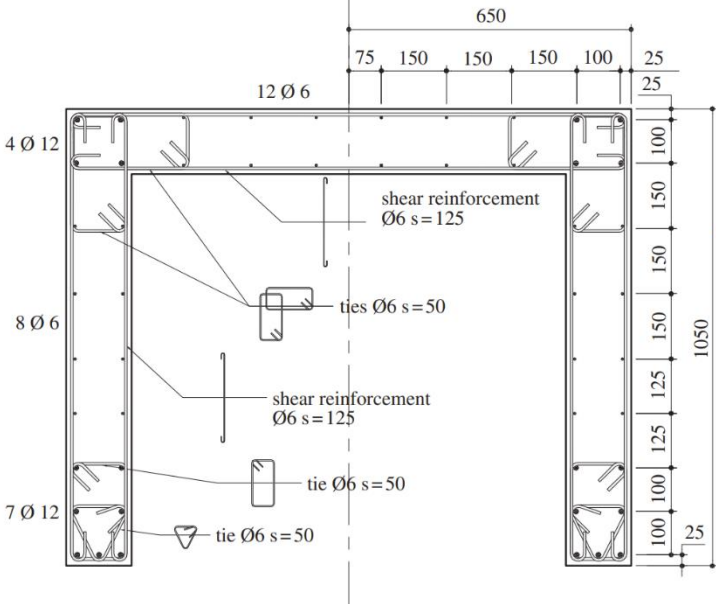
Cross-section and reinforcement detailing of TUA. Source: Beyer et al. (2008).
